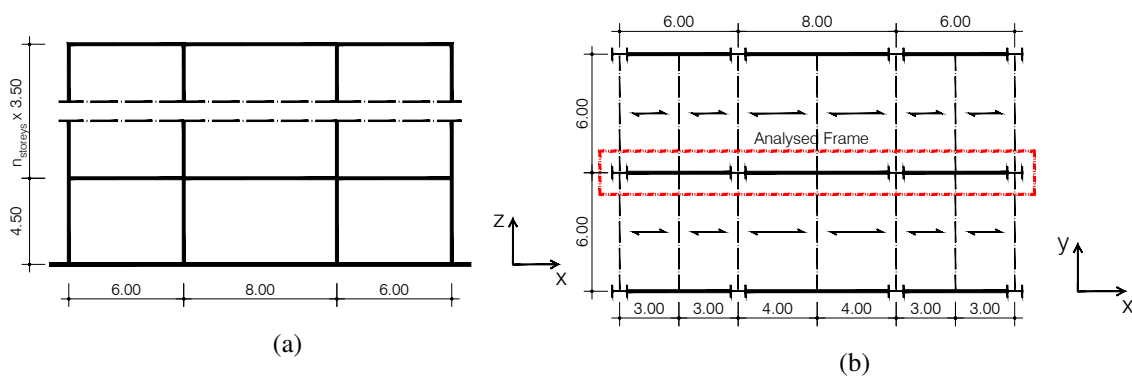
Building configuration 2: a) Elevation view, b) Plan view.
